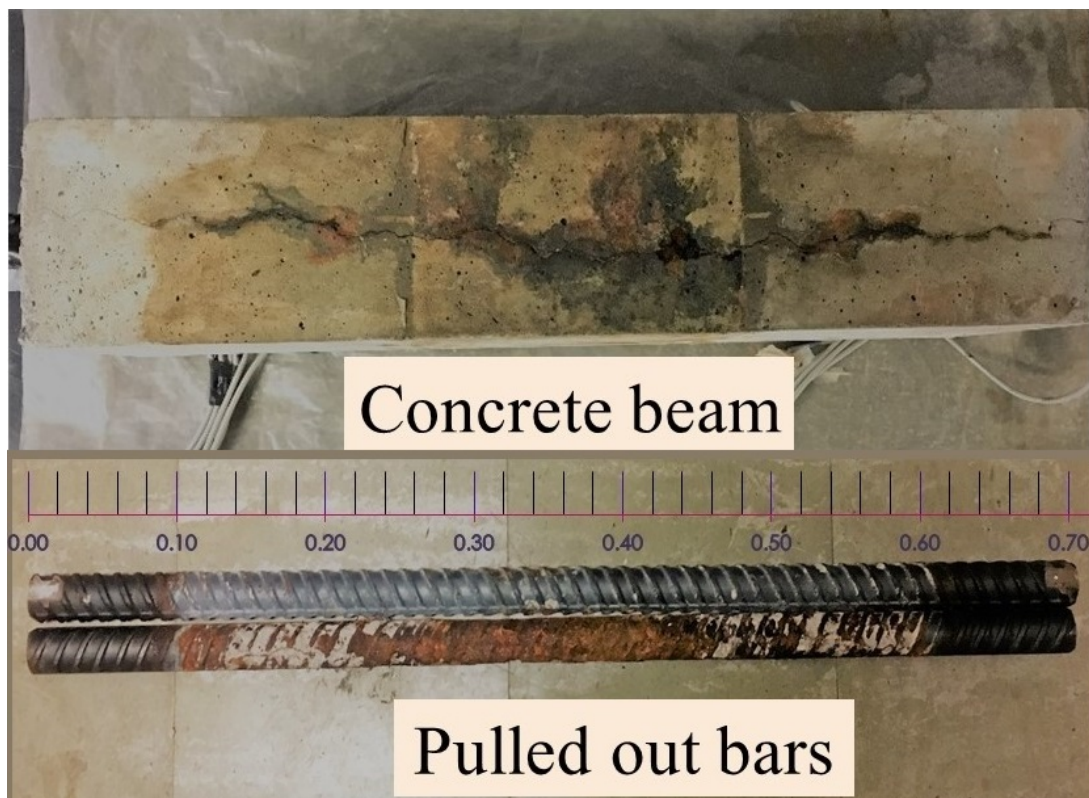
Cracked concrete beam and the pulled-out rebars after twelve days of corrosion.
